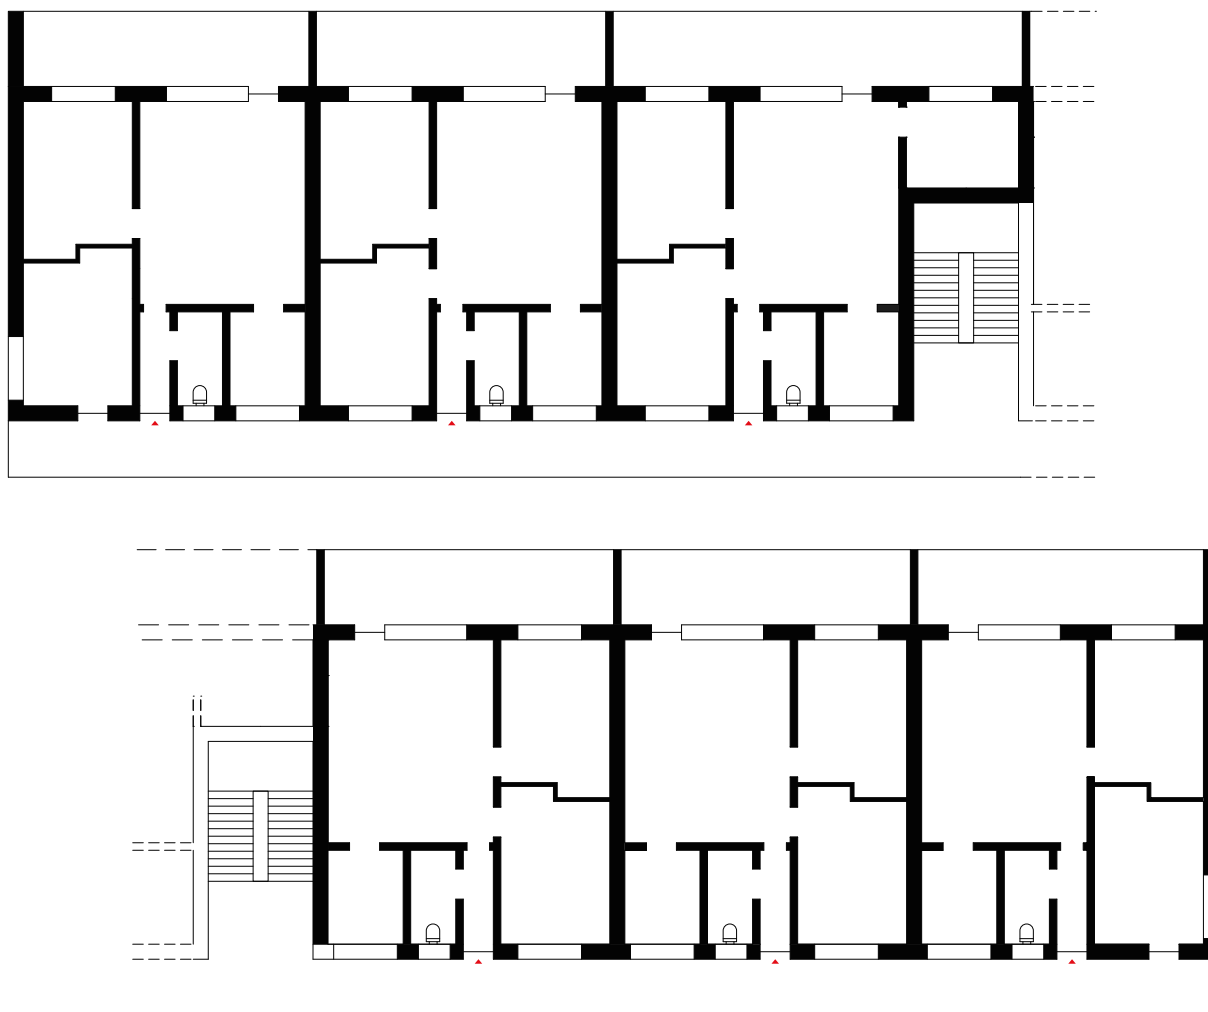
Plan, first floor of rowhouse, Siedlung Westhausen - 1:200
